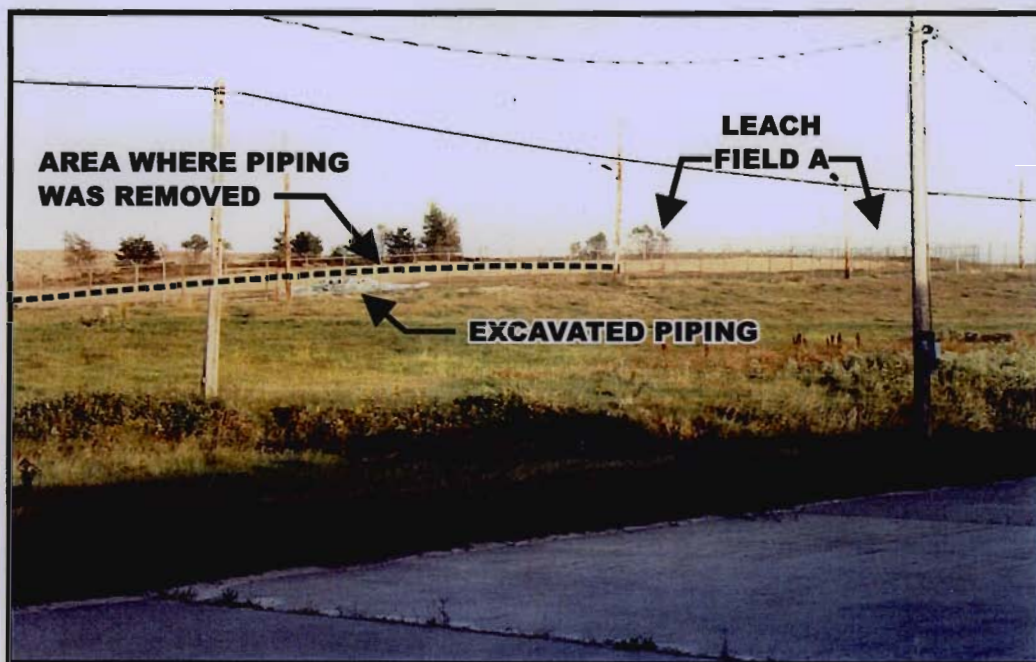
Eastward View from Building 3578 showing area excavated to remove piping leading from the lift station to former leach field A (September 1996).
